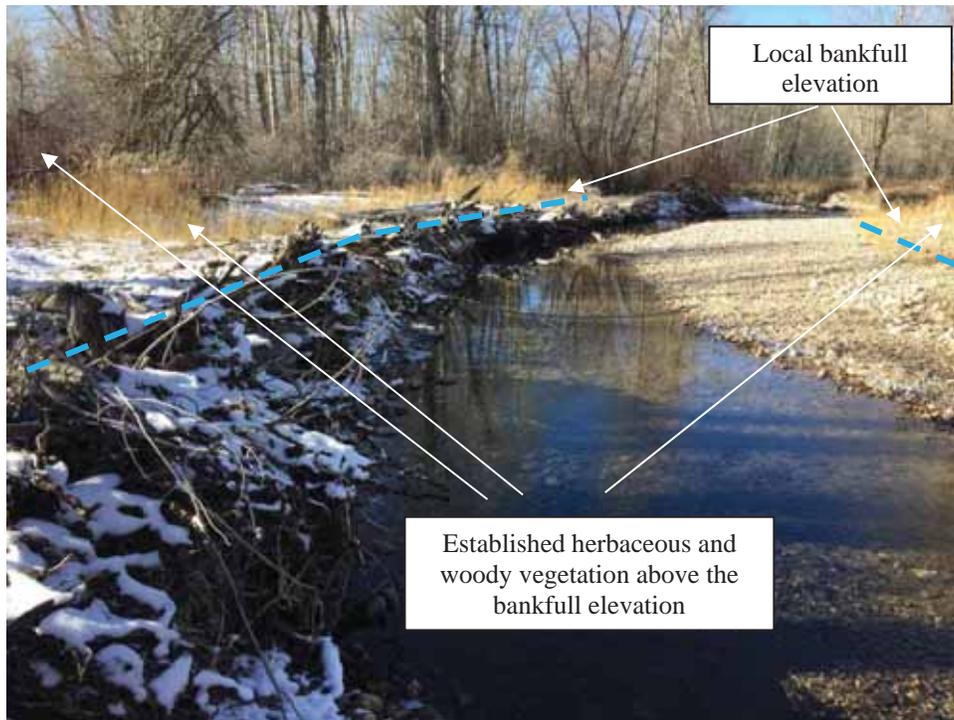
Photograph looking downstream at river left floodplain creation and root wad revetment (Station 700-850 ft), Badger Creek N3000W project reach.
